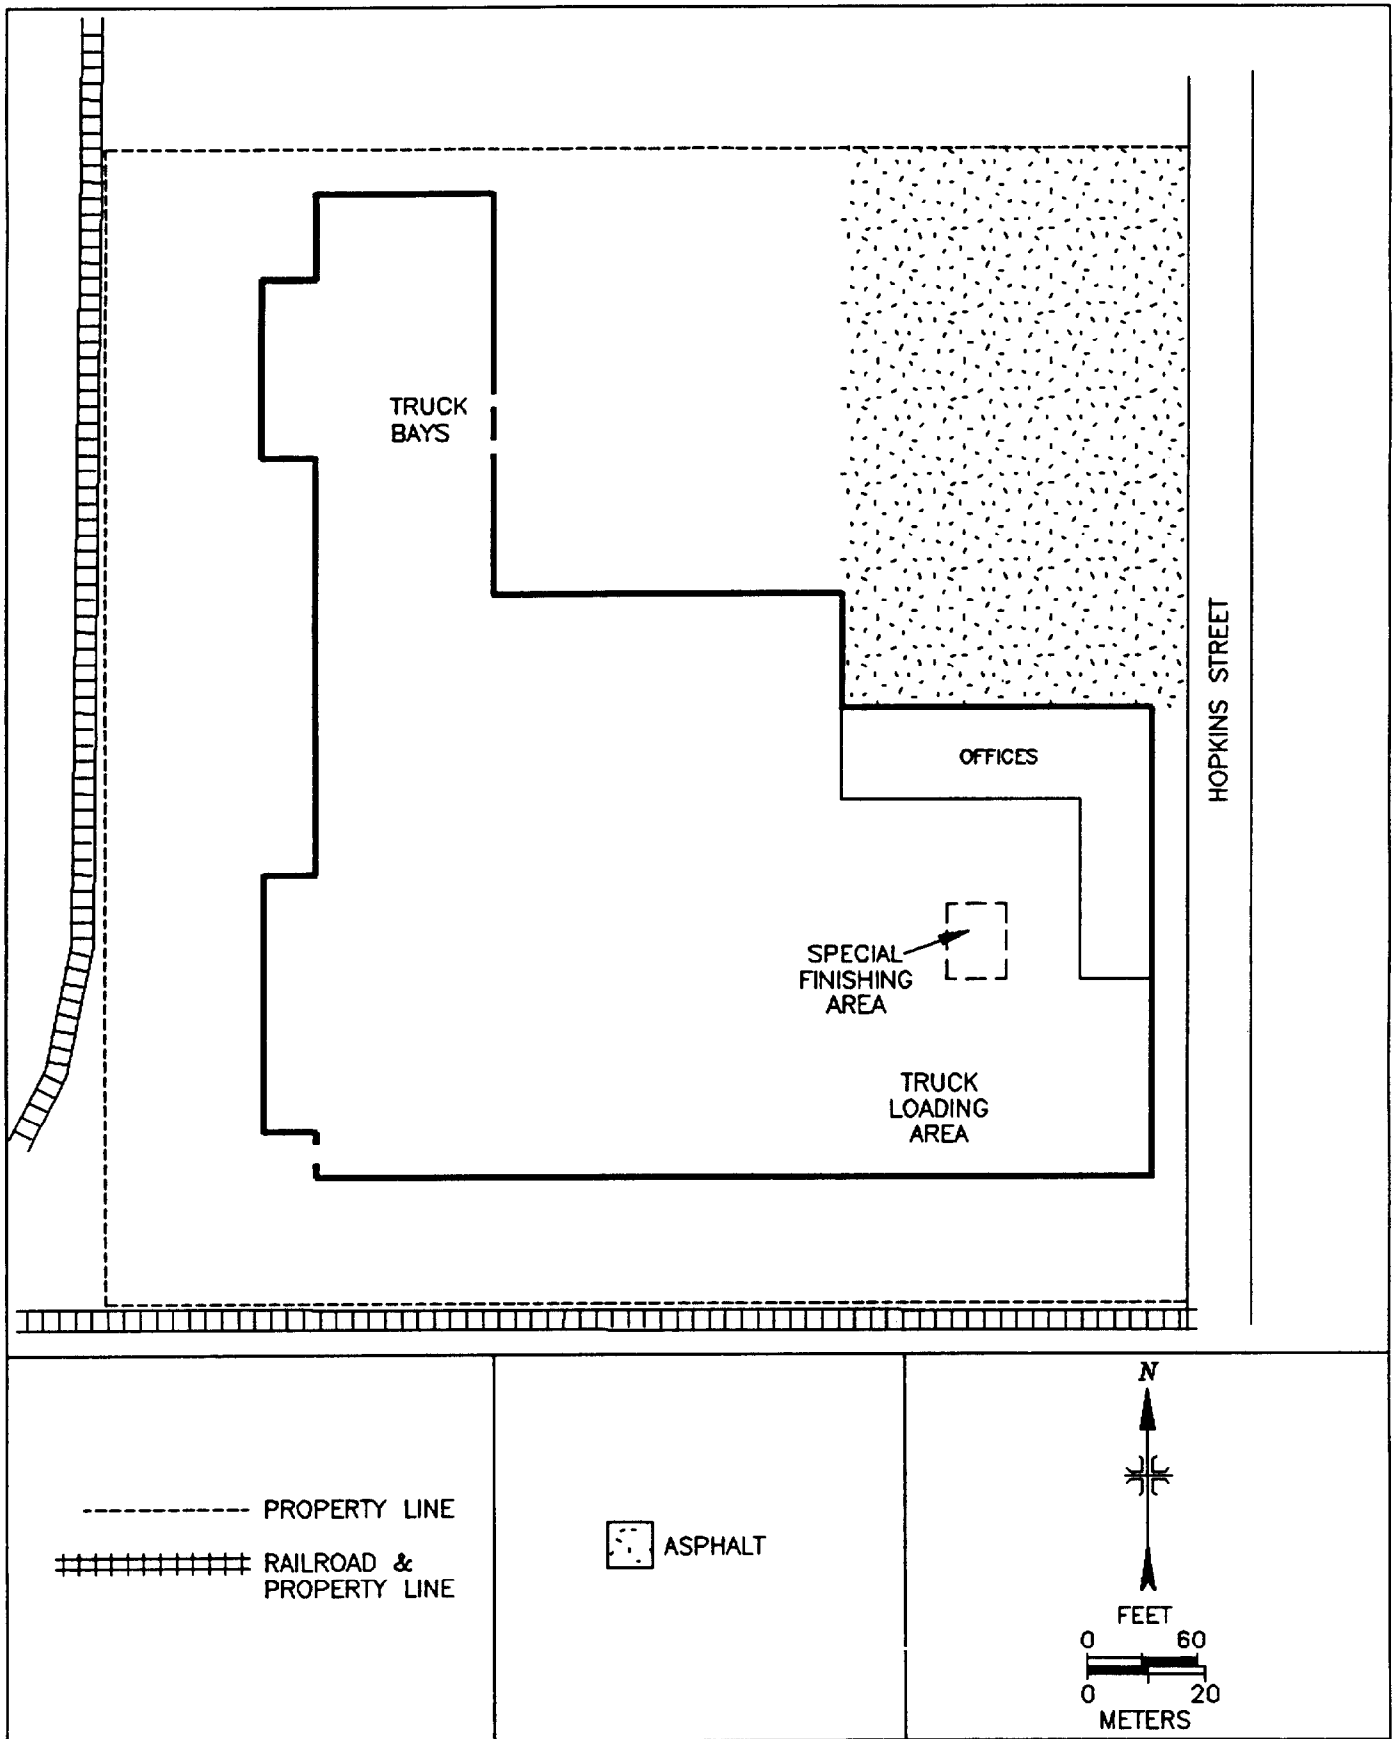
Former Bliss and Laughlin Steel Company Site - Plot Plan
